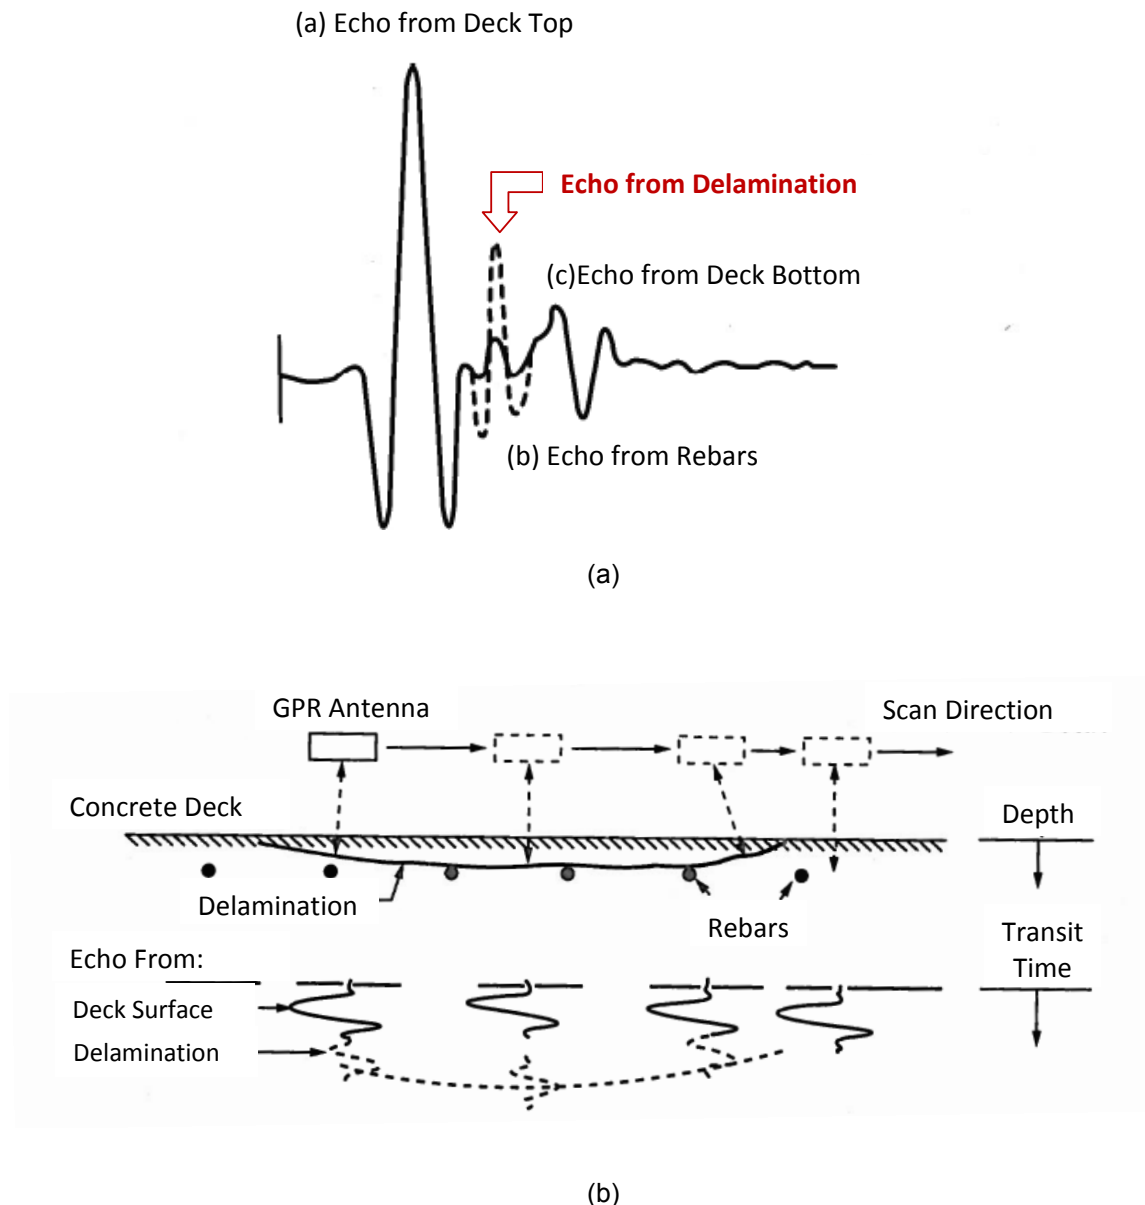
(a) Effect of Delamination on Radar Echoes from a Reinforced Concrete Deck Section, (b) the Development of an Idealized Depression Signature for Delamination
